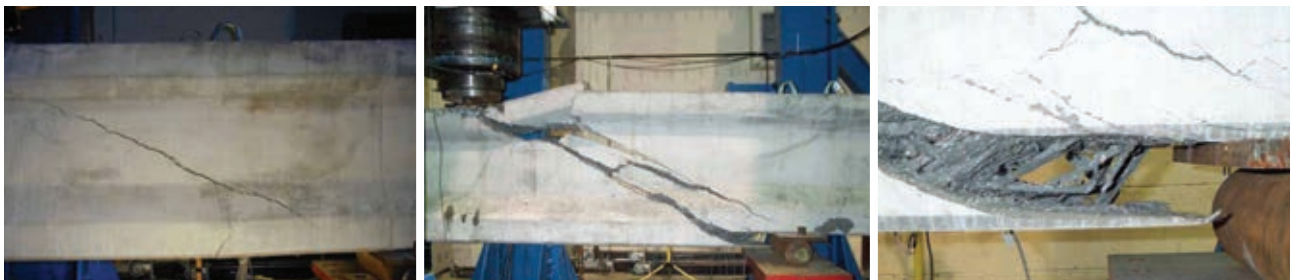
Shear failure in prestressed Ductal® cast I-beam.
